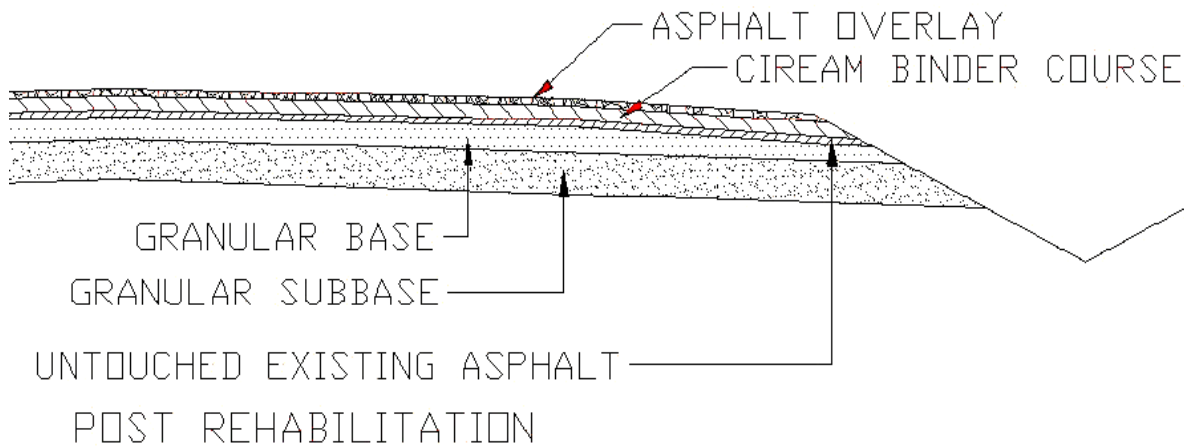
Cross section of a pavement rehabilitated with CIR or CIREAM (Chan, Tighe, & Chan, 2010)
